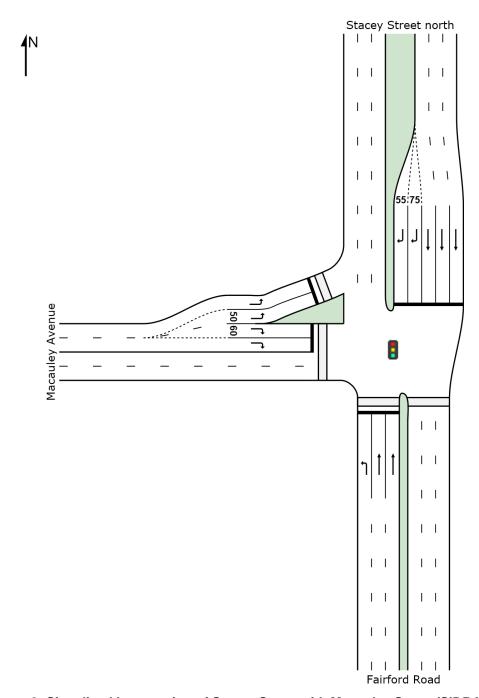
Signalised Intersection of Stacey Street with Macauley Street (SIDRA)
